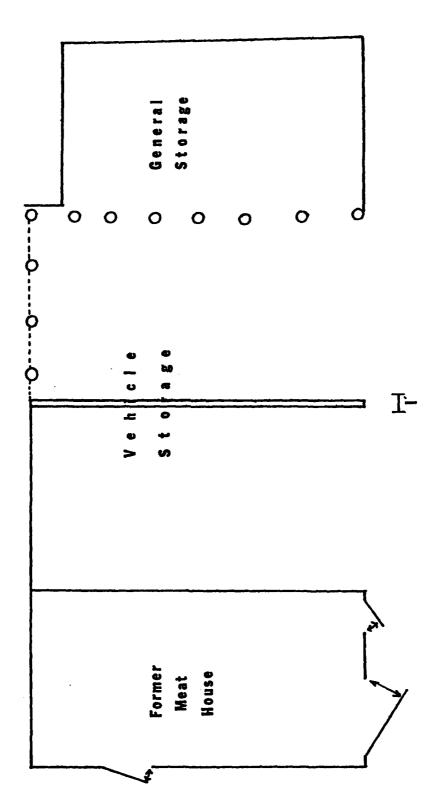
Cumingham outbuilding. Plan of Former Meat House and Vehicle Shed.
